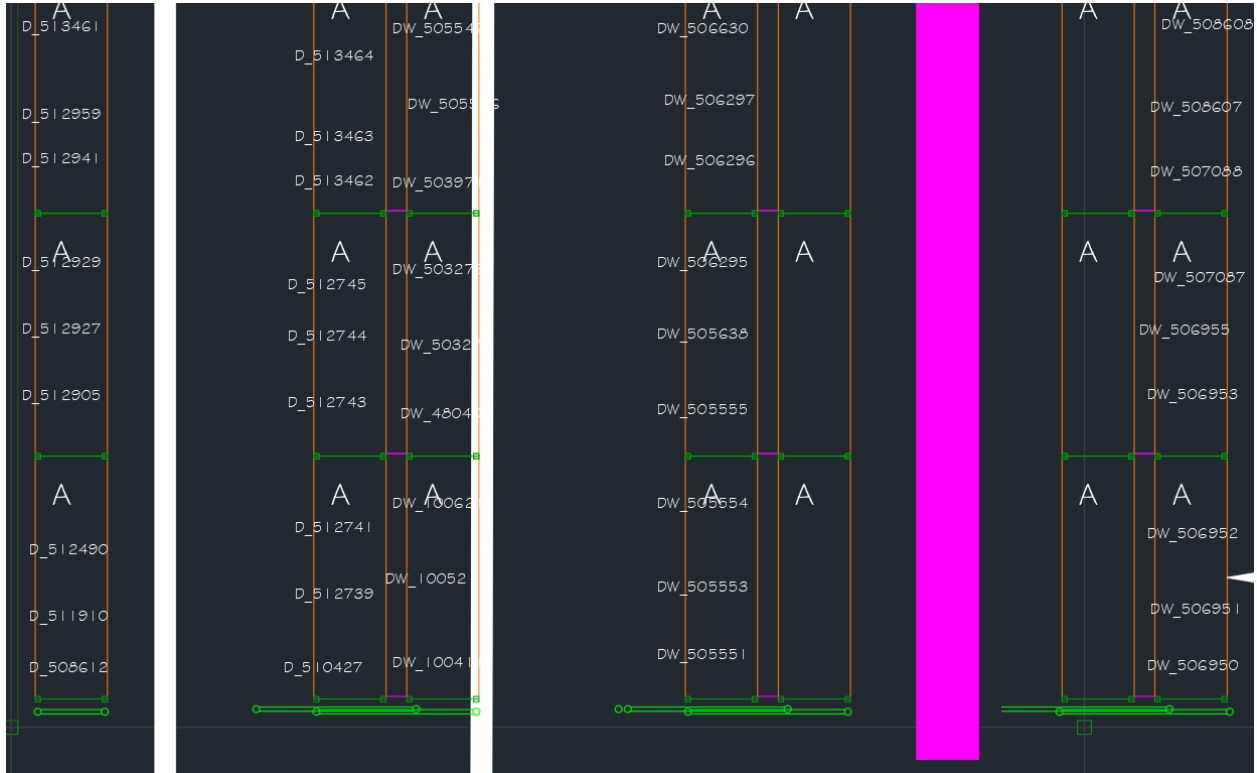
Zoomed-in Portion of AutoCAD Drawing with Added Location Text Layer
